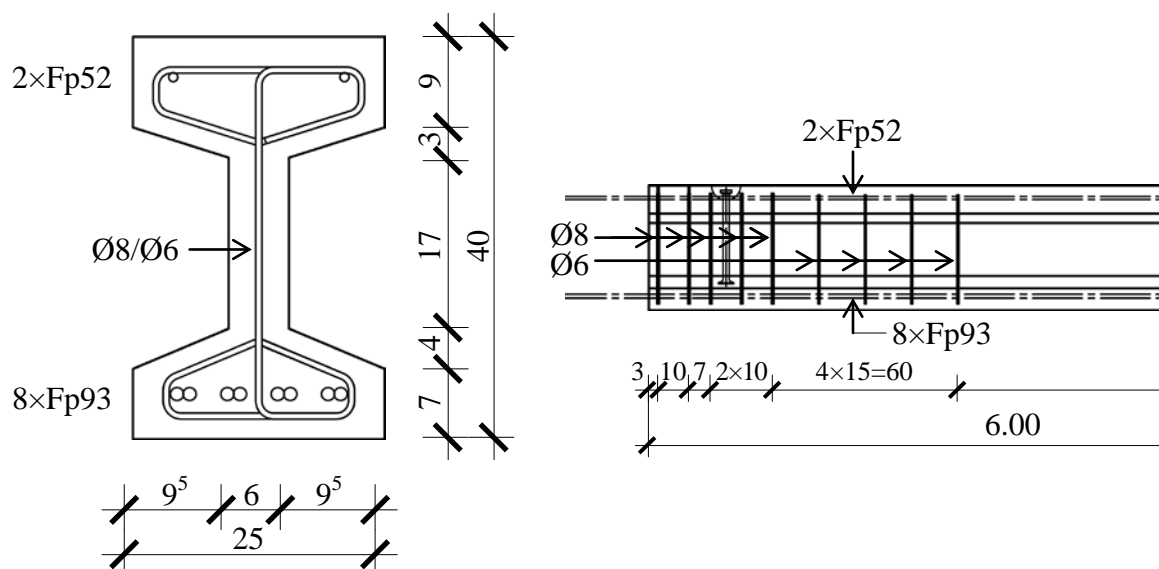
Typical cross-section and reinforcement of the analysed beams
